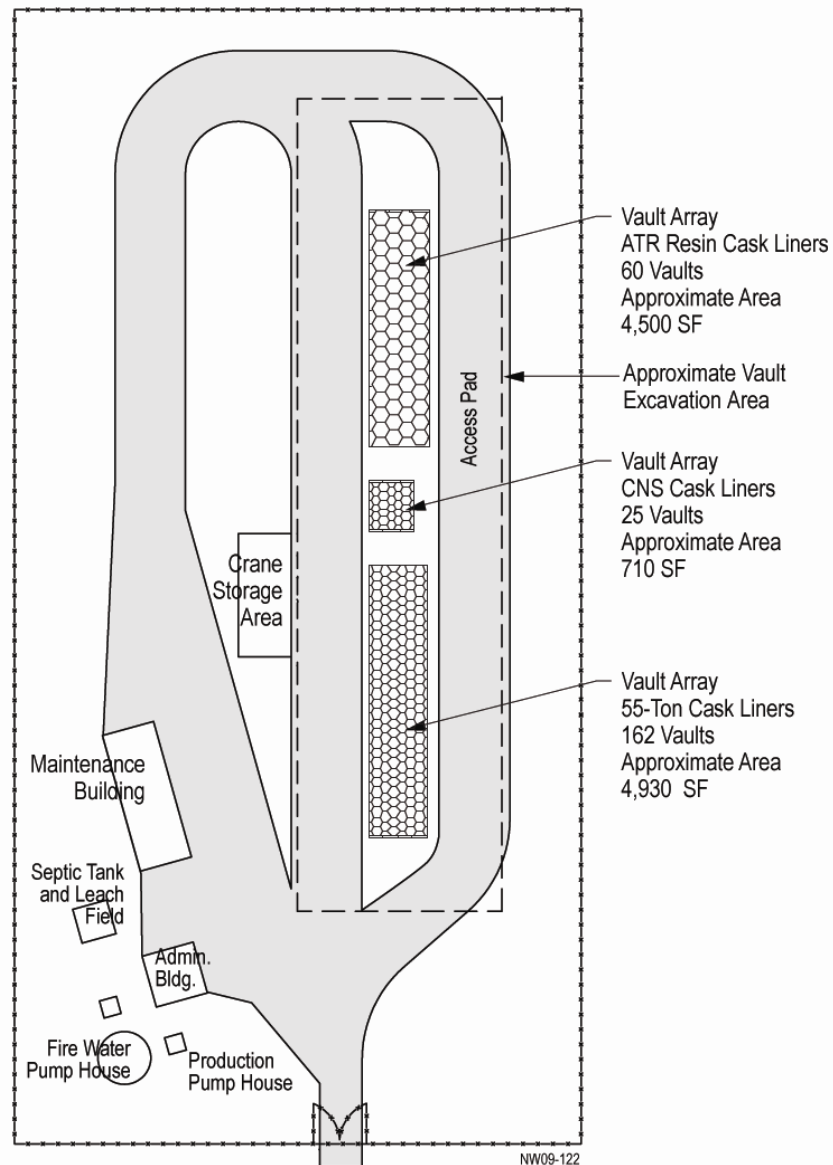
Proposed layout for the Remote-Handled Low-Level Waste Disposal Project.
